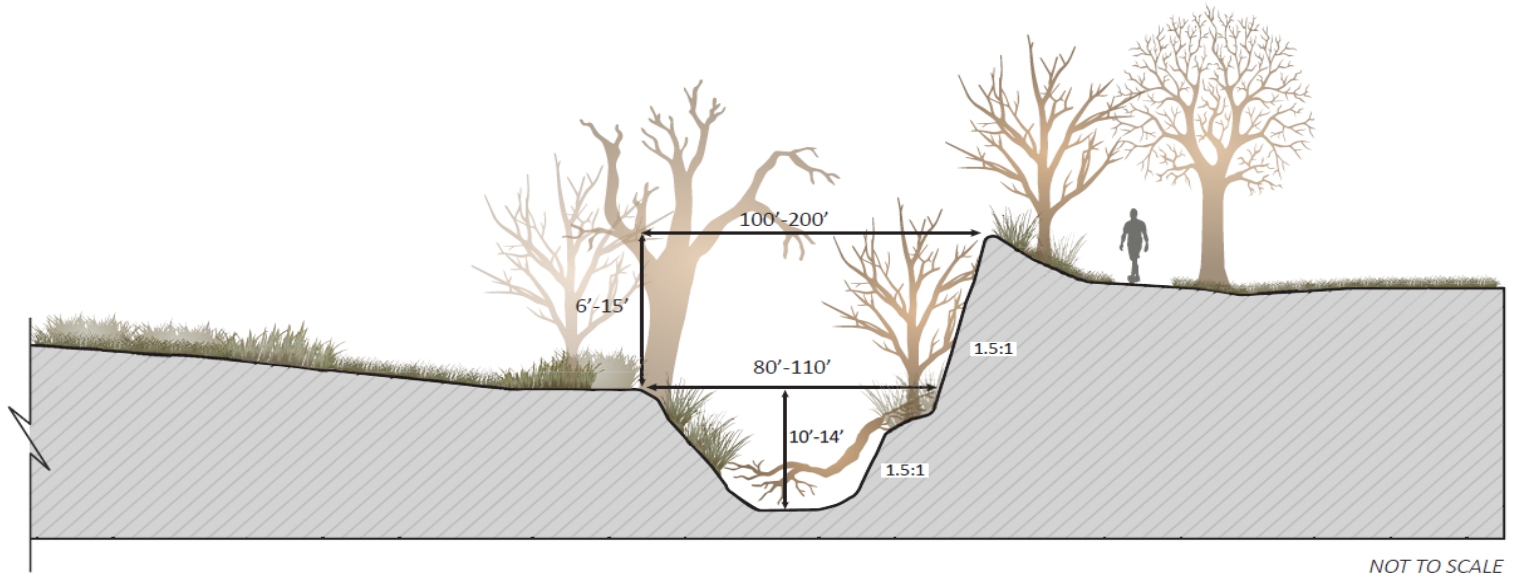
Typical Reach 5 cross-section (south half), looking downstream
